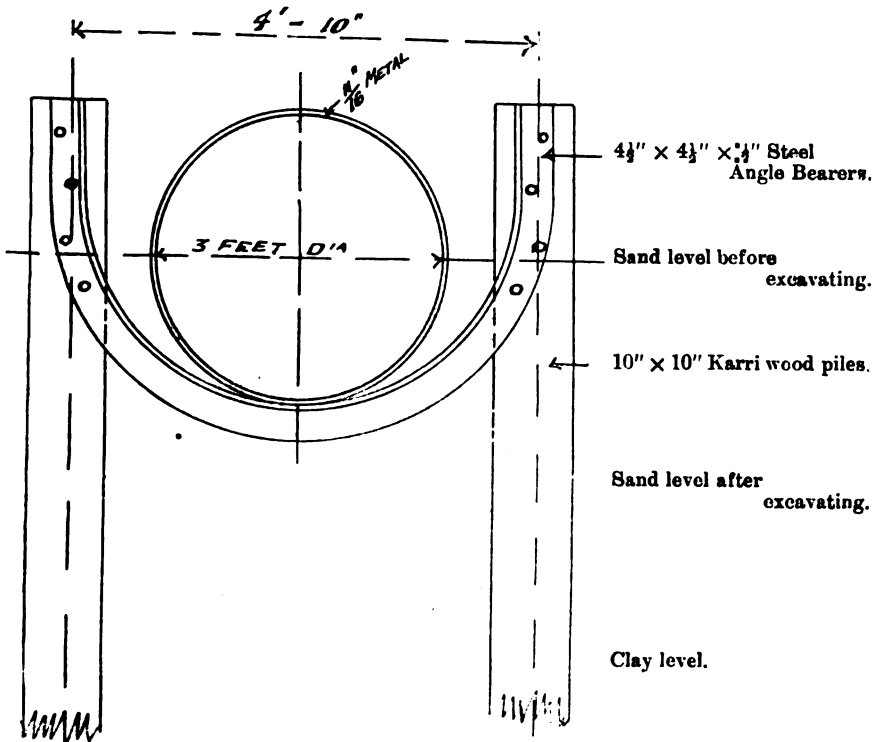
CROSS SECTION, showing Piles and Cradling to receive connecting end of Tube.
